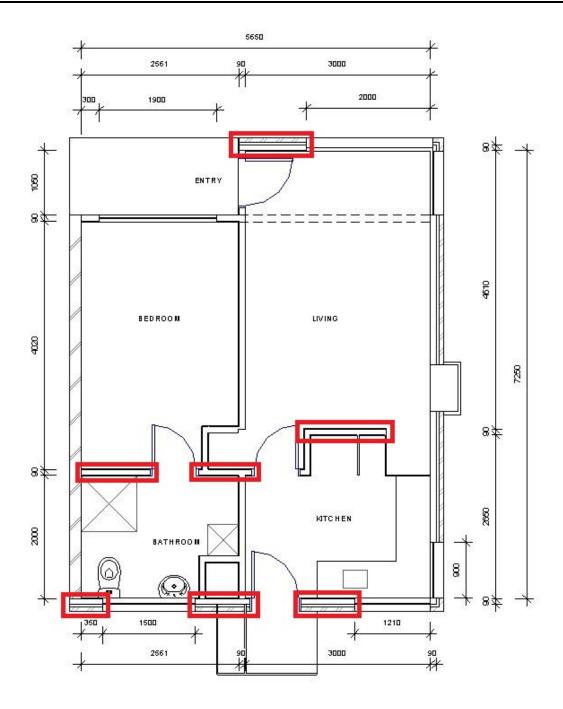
Walls used for bracing in the longitudinal direction in Blocks A and B.
